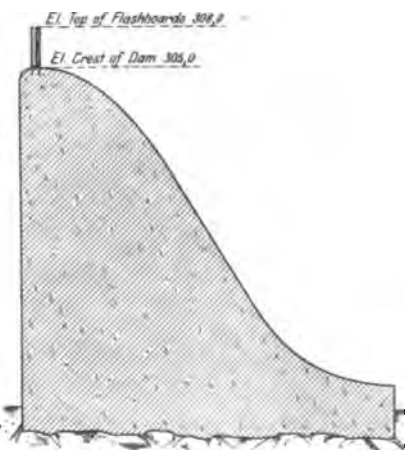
Detail of Flashboard Arrangement of the Schaghticoke Dam.
